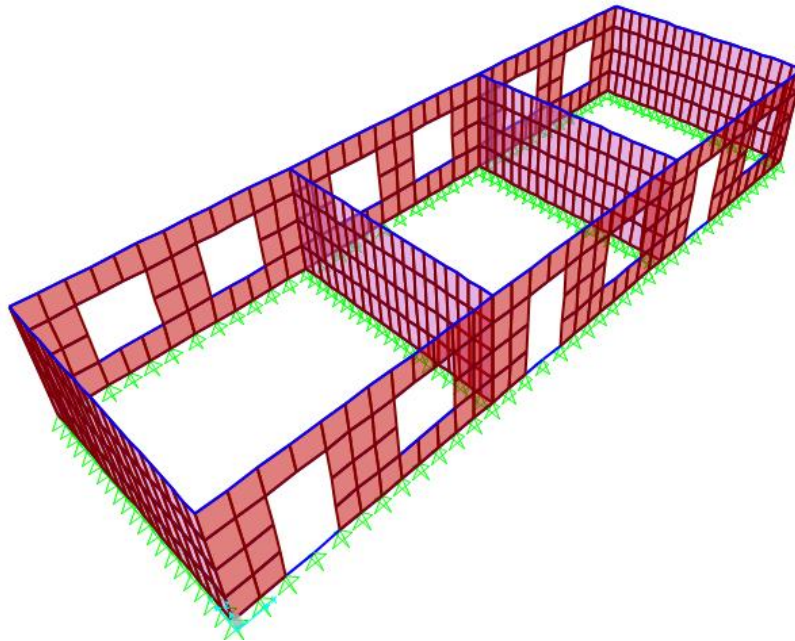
School WPL model 3D view: Door wall (front); Window wall (back)
